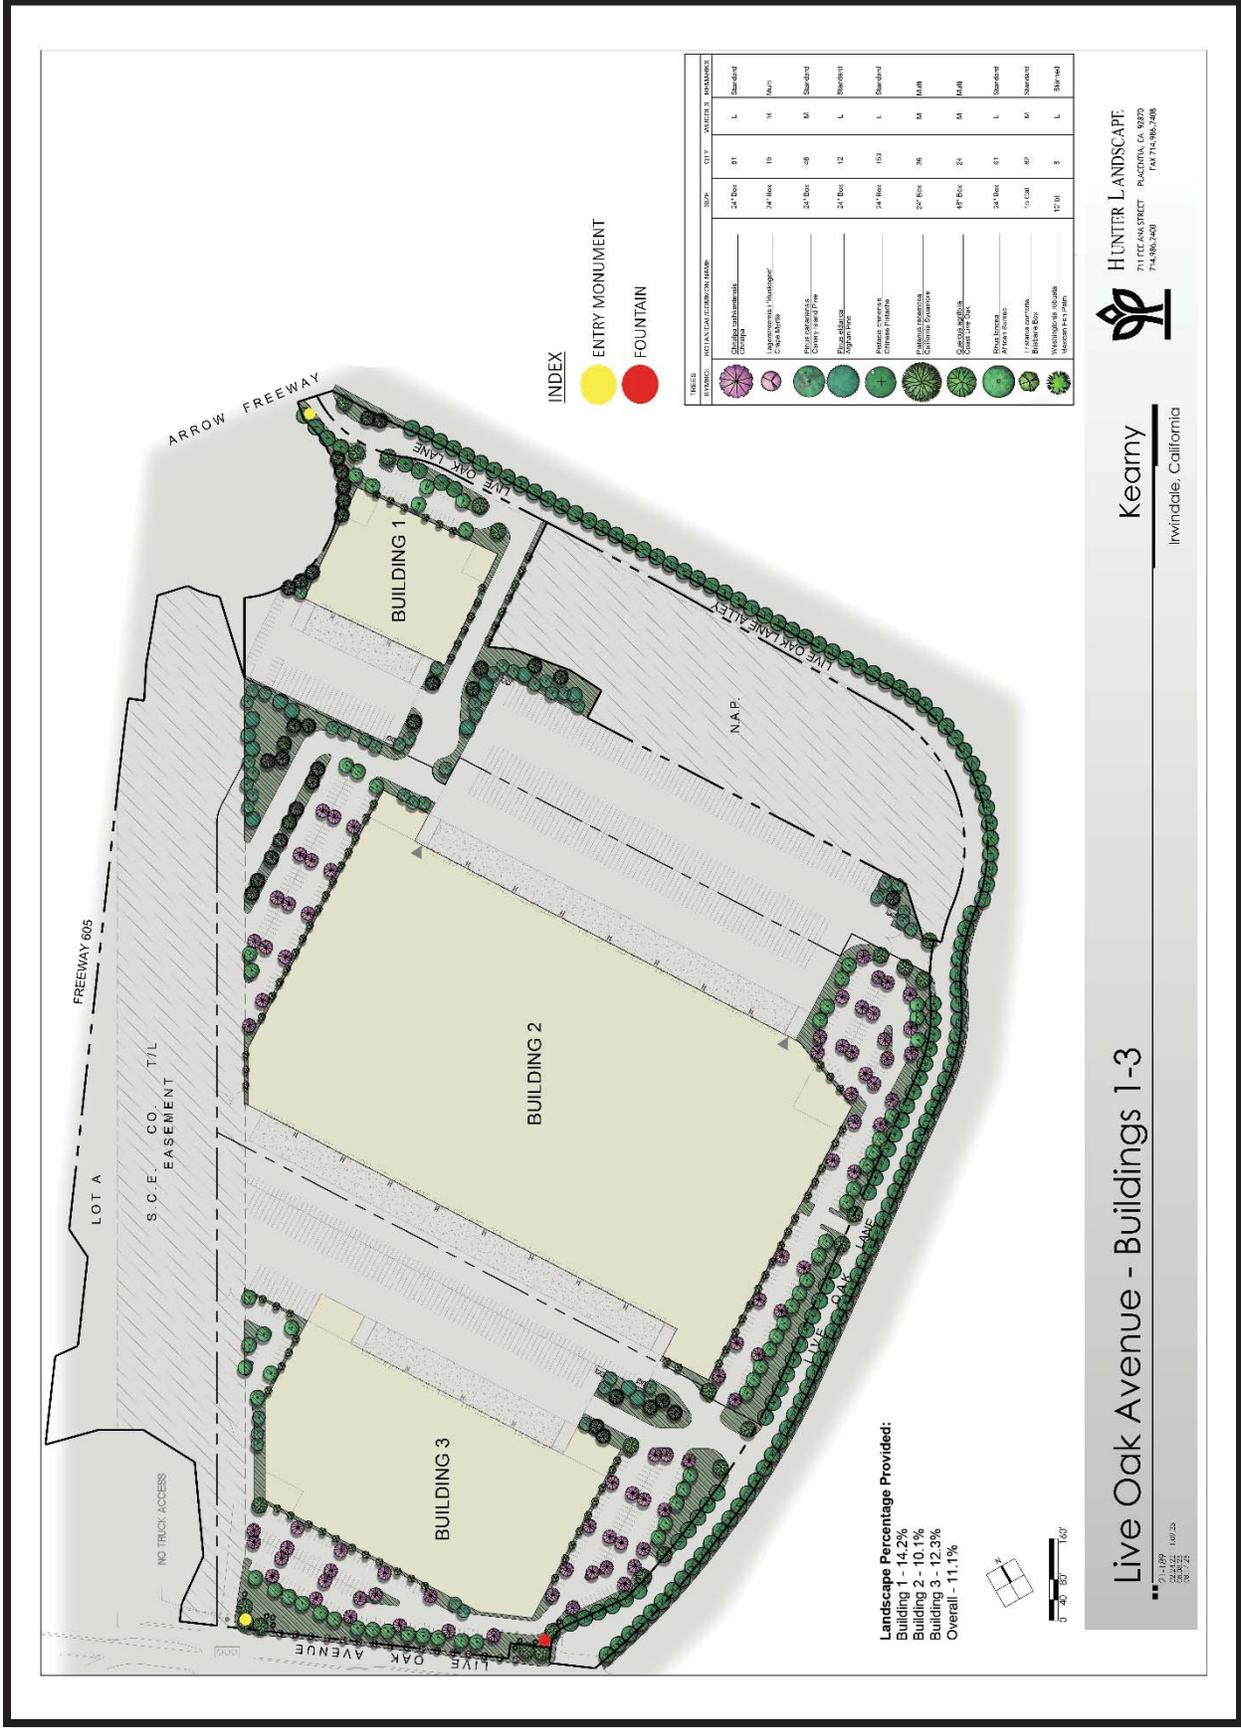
CONCEPTUAL LANDSCAPE PLAN WITHOUT BESS
